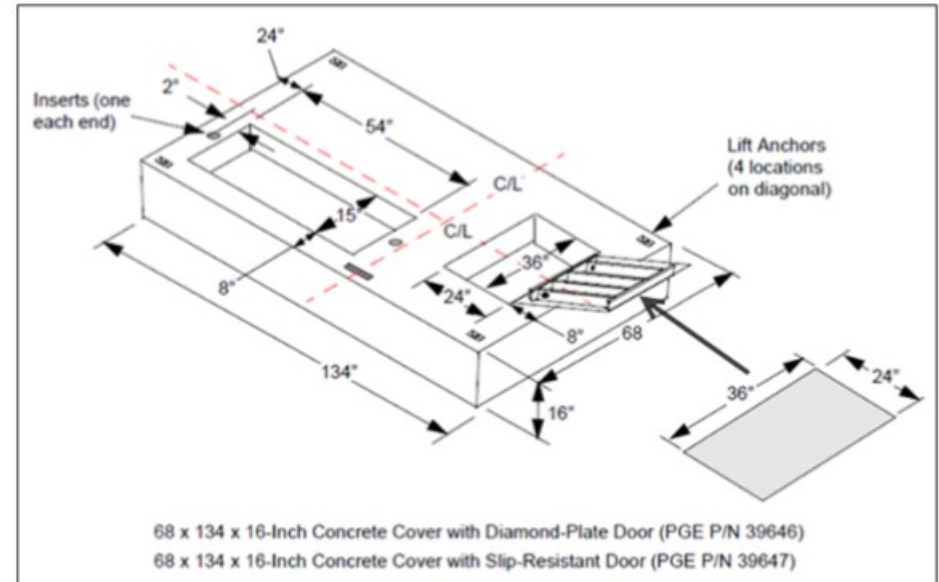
Design Details of Concrete Covers for 68" x 134" x 70" Concrete Vaults
